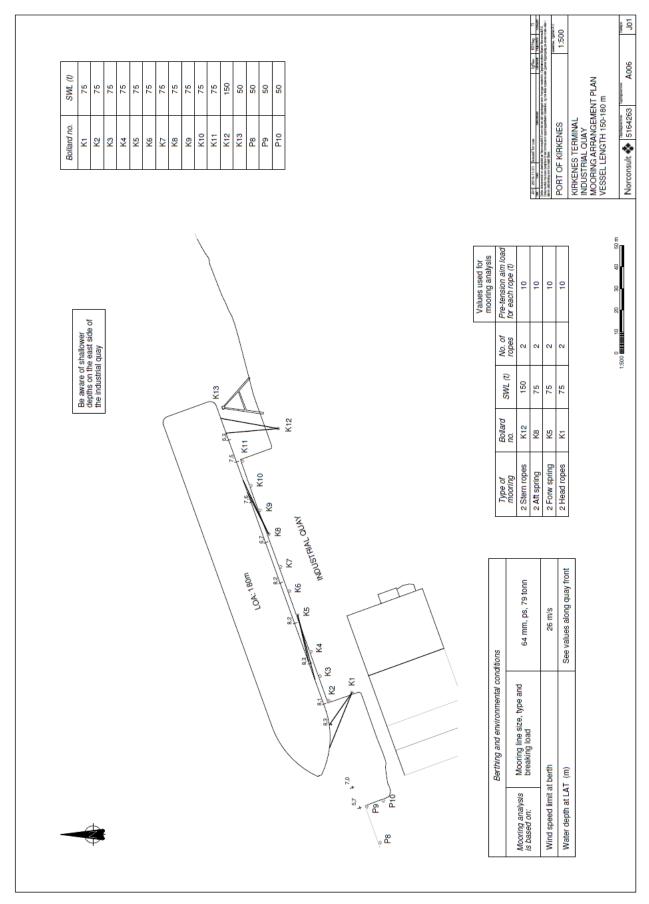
Mooring plan Industrial Quay, LOA 150 - 180m
